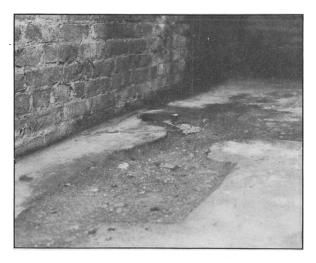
DEFECTIVE CONCRETE FLOOR IN BASEMENT, CONCRETE LAYER TOO THIN; HAS BECOME BROKEN AND NOW PERMITS BURROWING AND RAT HARBOR BENEATH.
